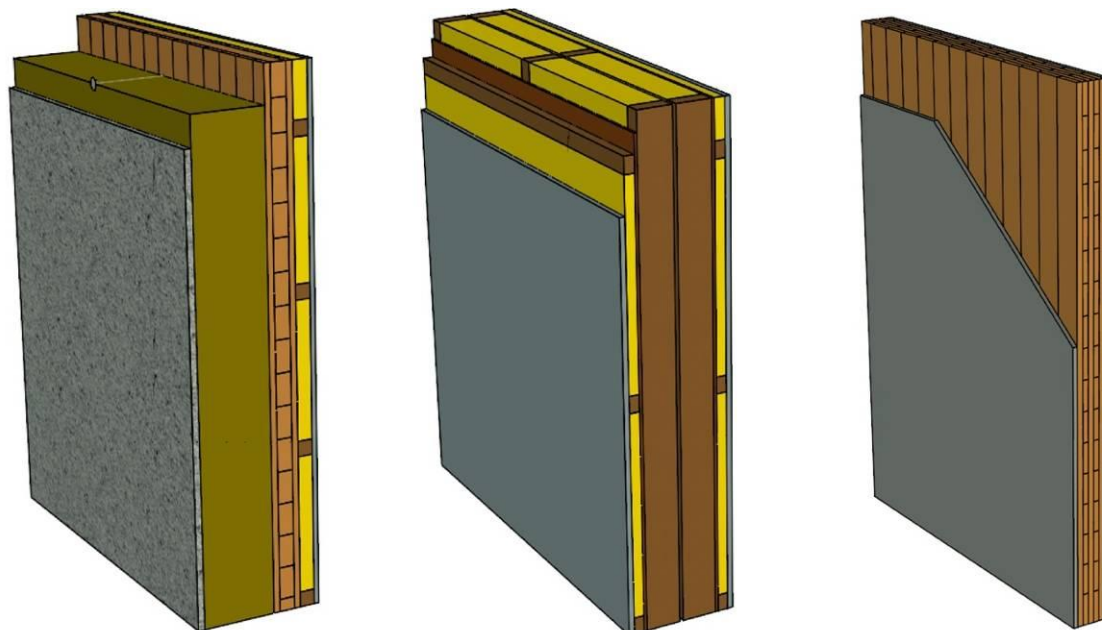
Examples of (from left to right) exterior wall, apartment separating timber framed wall and interior partition wall within an apartment (also stabilising).
